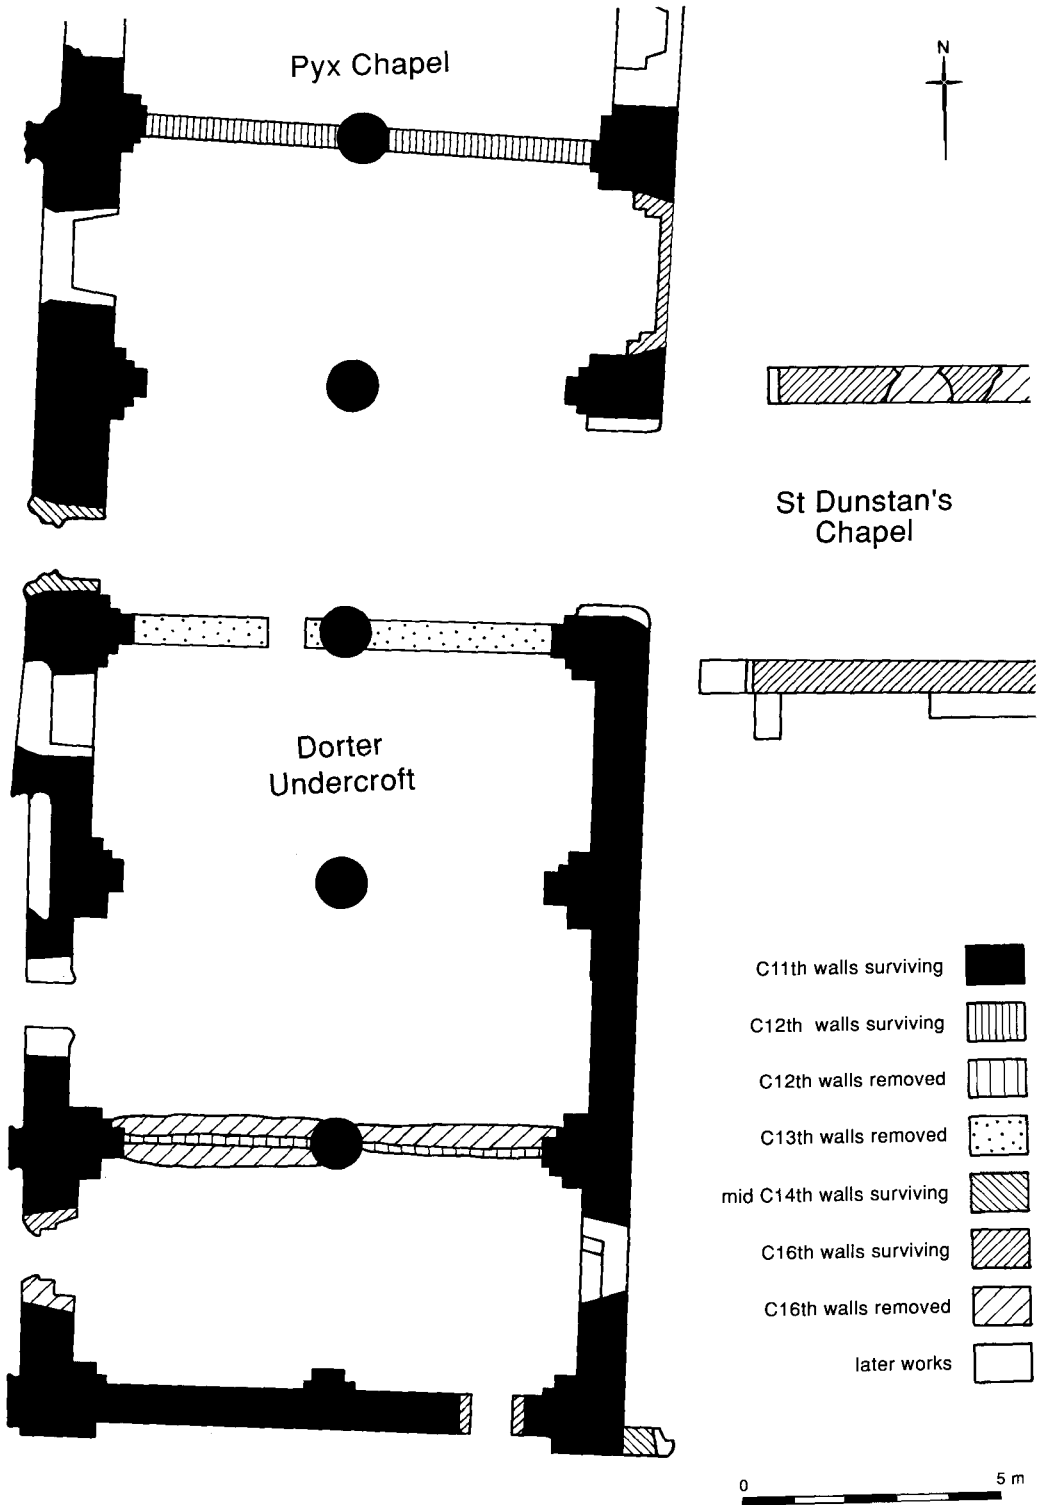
Historical ground plan of dorter undercroft showing construction dates (from RCHM)
